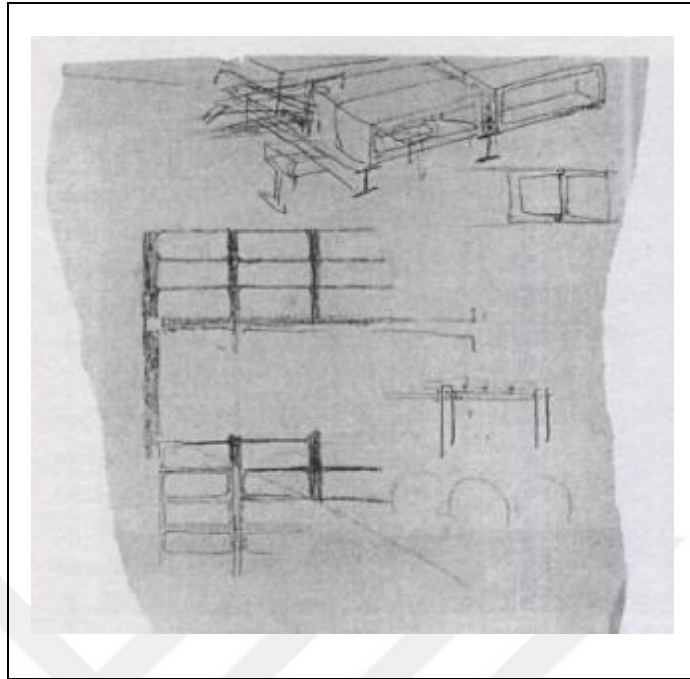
Dom-Ino House sketch layout of prefabricated floor slabs and I profiles [41].
